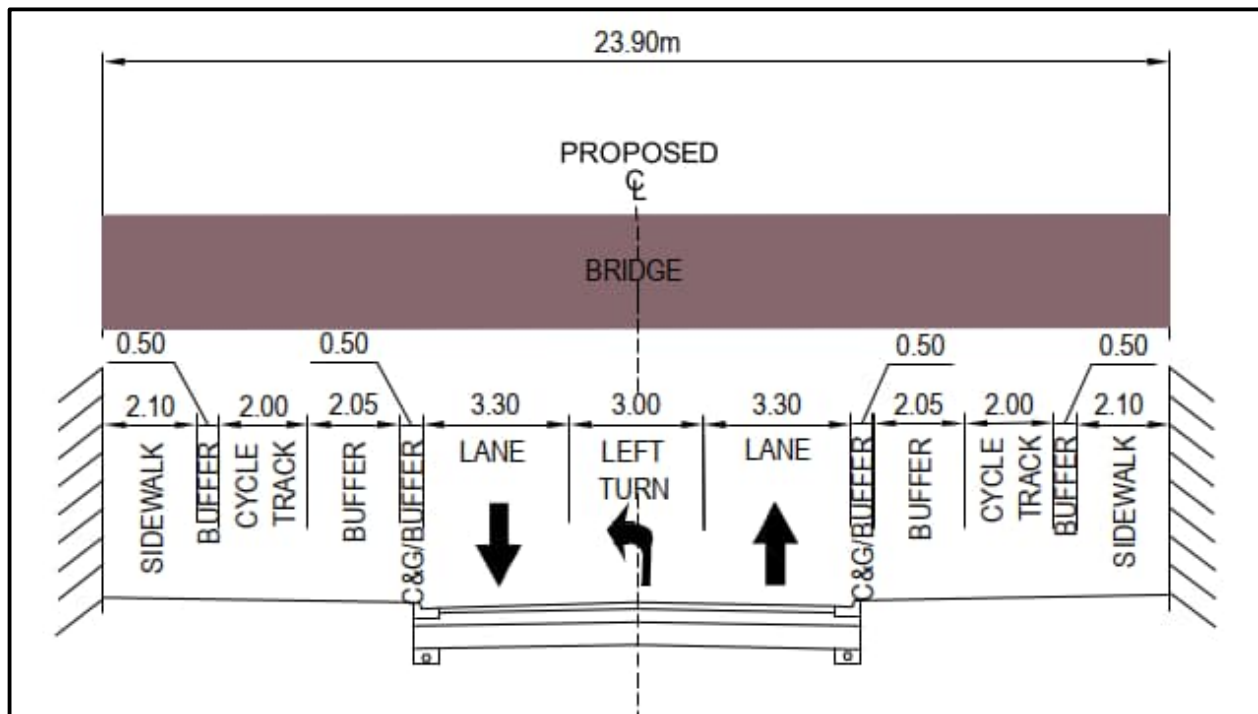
Park Lawn Road Improvements, South of The Queensway – Typical Concept Cross-section
